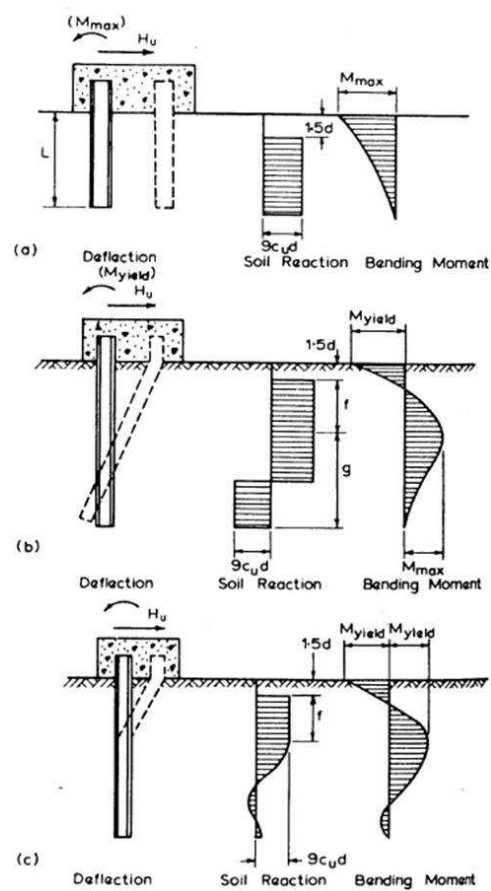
Failure mechanism for fixed-head piles in cohesive soil (after (Broms, 1964)); a) short pile, b) intermediate pile, c) long pile
